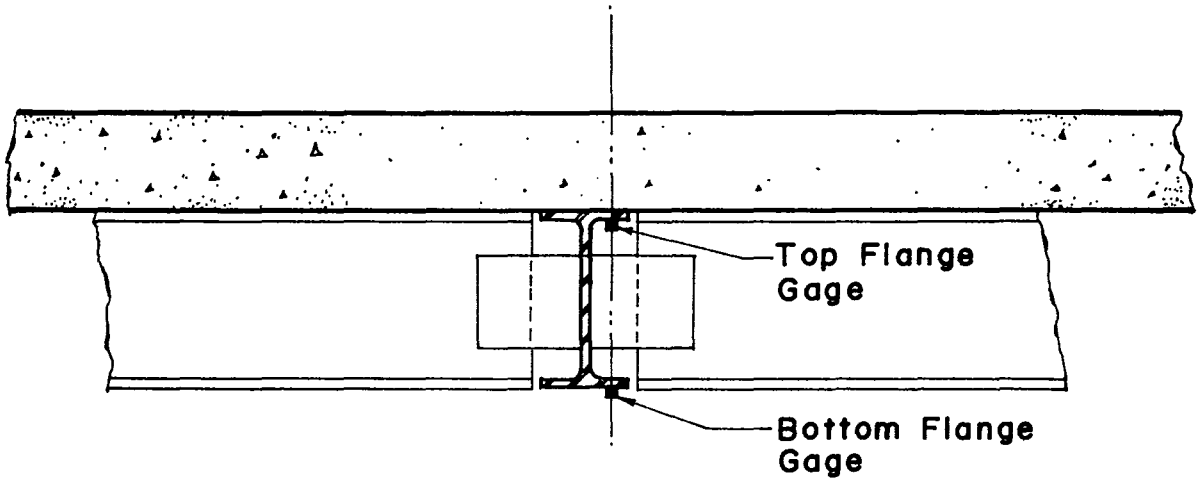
POSITIONS OF DIAL GAGES AND LOAD PLATES-STRUCTURE 98.
